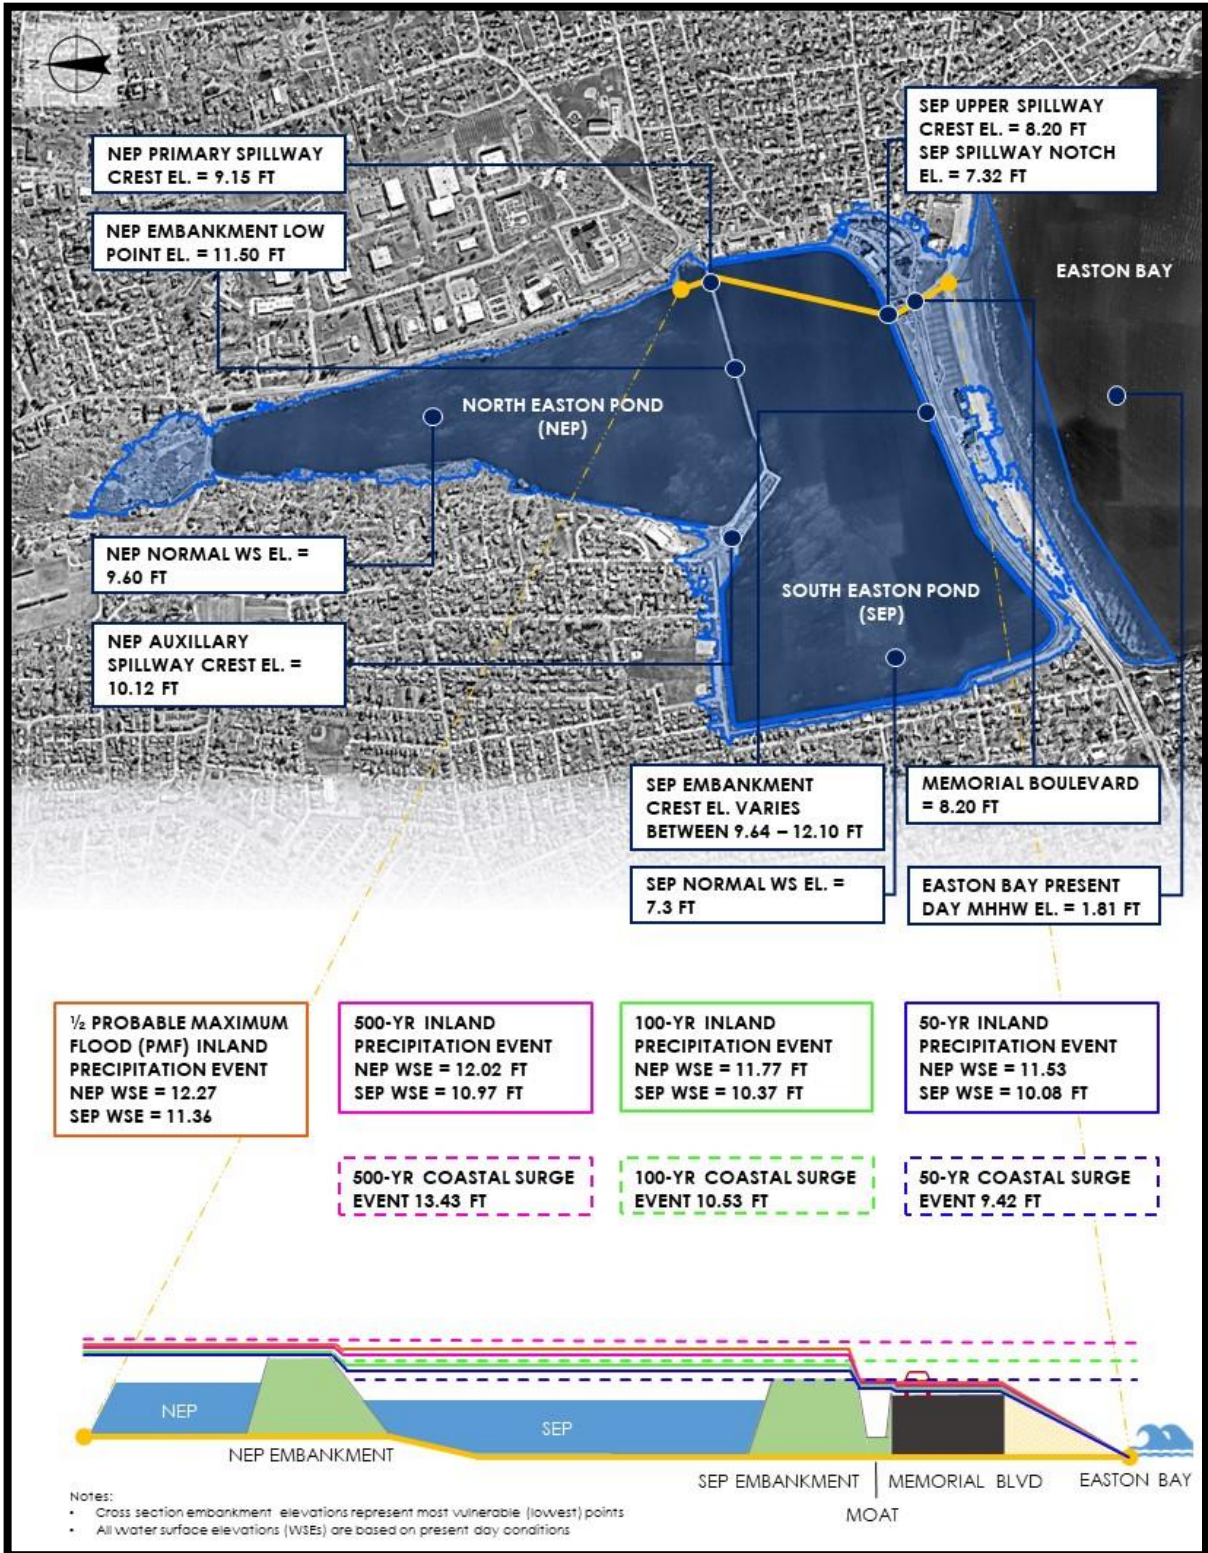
Peak Water Surface Elevations Plan & Profile View for Existing Conditions (Present-Day)
